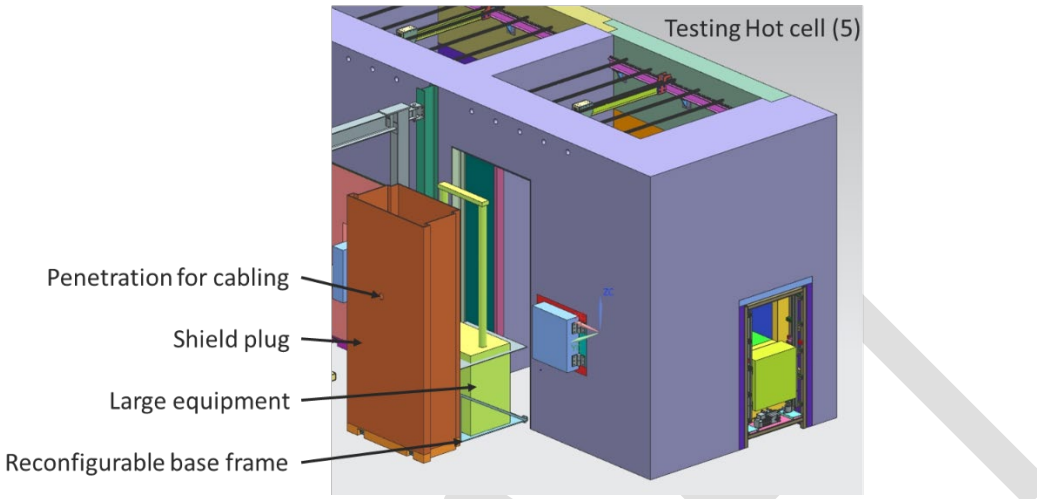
concept of large passthrough “B” with one large equipment placed on the shield plug
